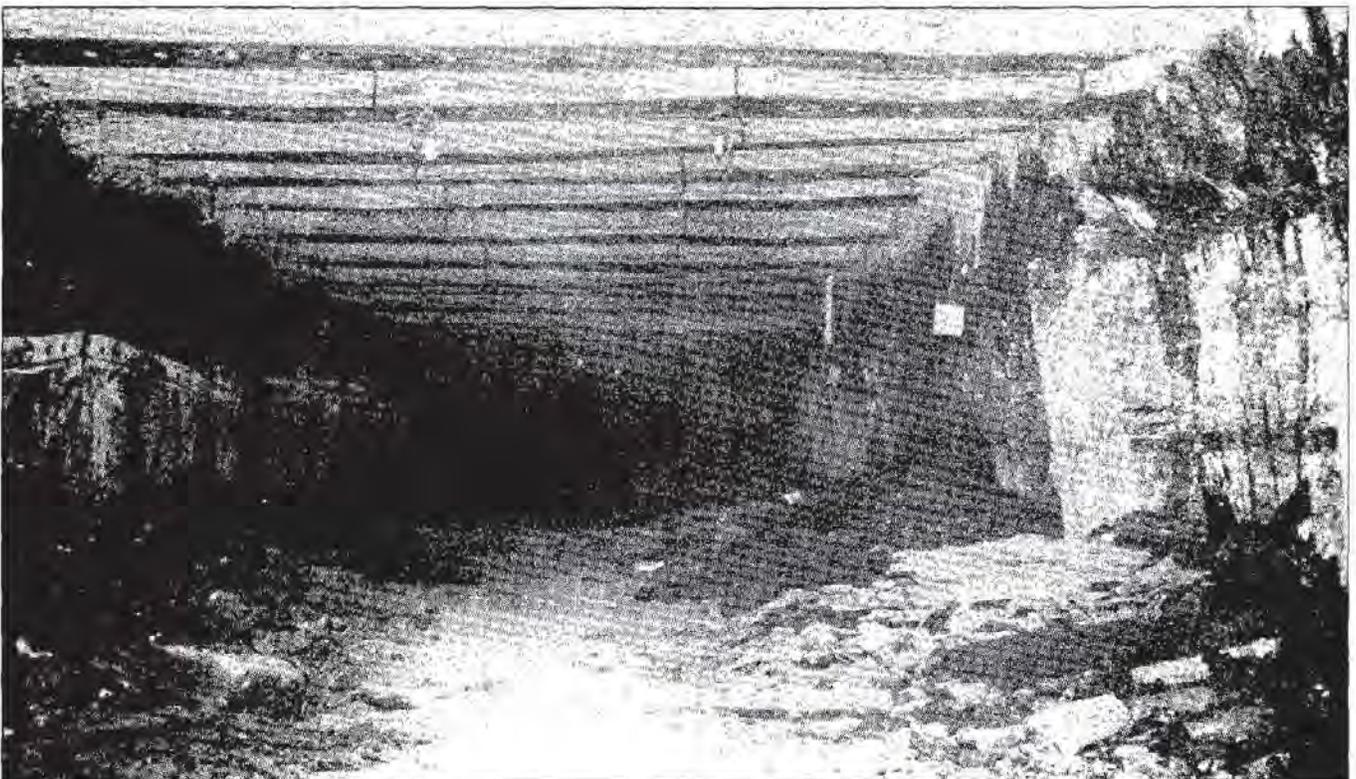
Resin-grouted cable test area after the first panel has passed and the loads have been redistributed onto the pillars and next panel.
